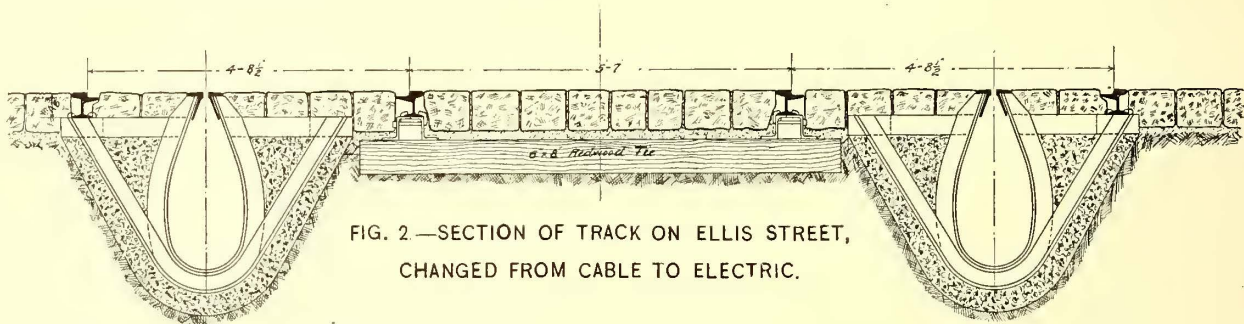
SECTION OF TRACK ON ELLIS STREET, CHANGED FROM CABLE TO ELECTRIC.
